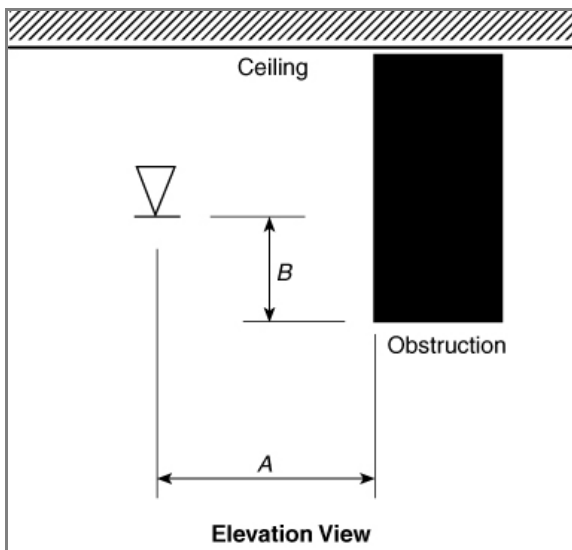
(b) Obstruction Against Wall (SSU/SSP).
